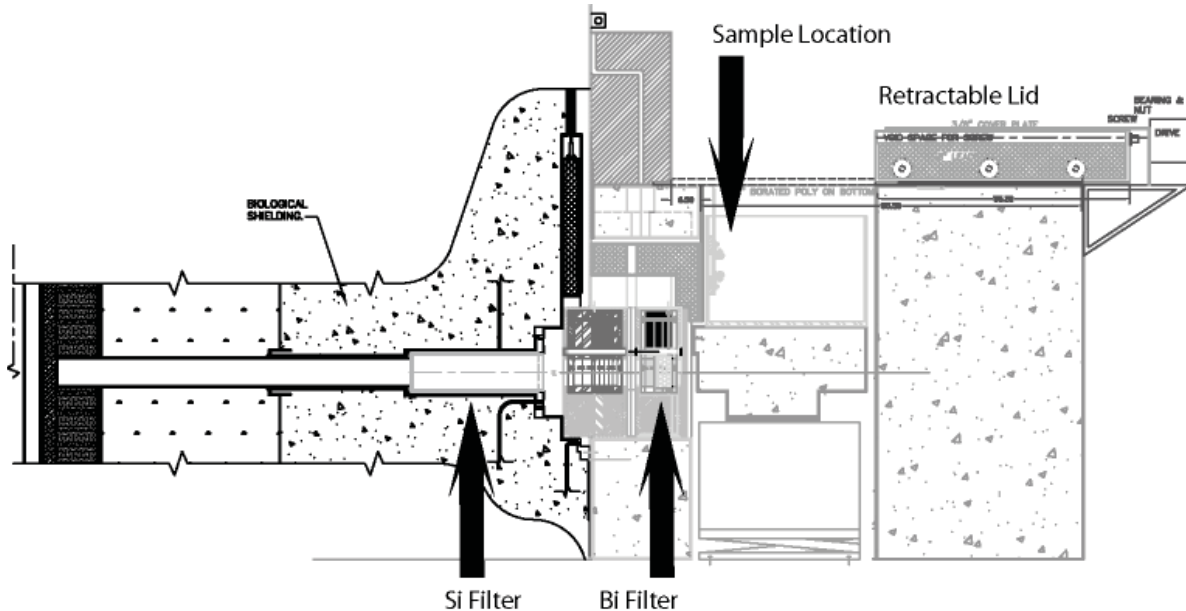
MURR thermal beamline design detail, shown in a closed configuration to allow access to samples.
